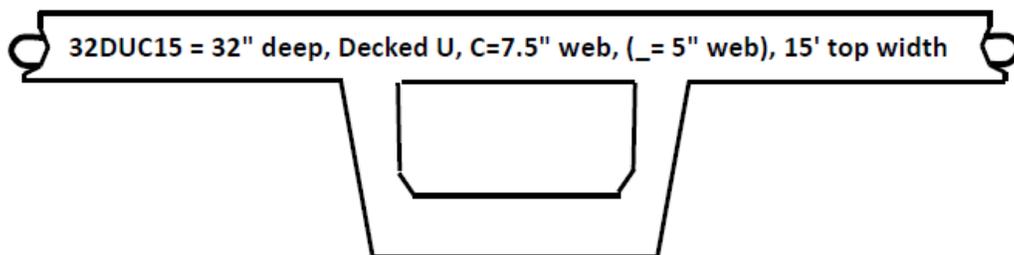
12 A sample decked U girder: top widths 15 feet 0 inch, 9 feet 10 inches, or 7 feet 3 inches [18].
